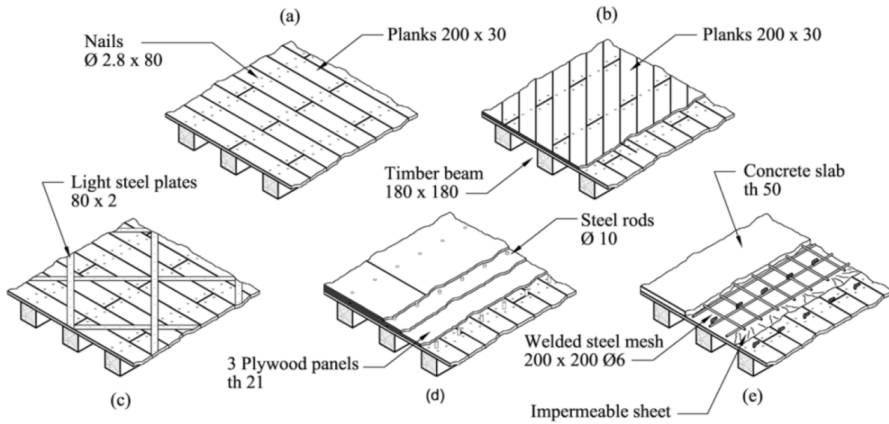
Different timber-floor in-plane-shear strengthening techniques: (a) existing simple layer of wood planks on the timber beams; (b) second layer of wood planks crossly arranged to the existing one and fixed by means of steel studs; (c) diagonal bracing of the existing wood planks by means of light steel plates or FRP laminae; (d) three layers of plywood panels glued on the existing wood planks; (e) a stud-connected reinforced concrete slab (all measures in mm)
